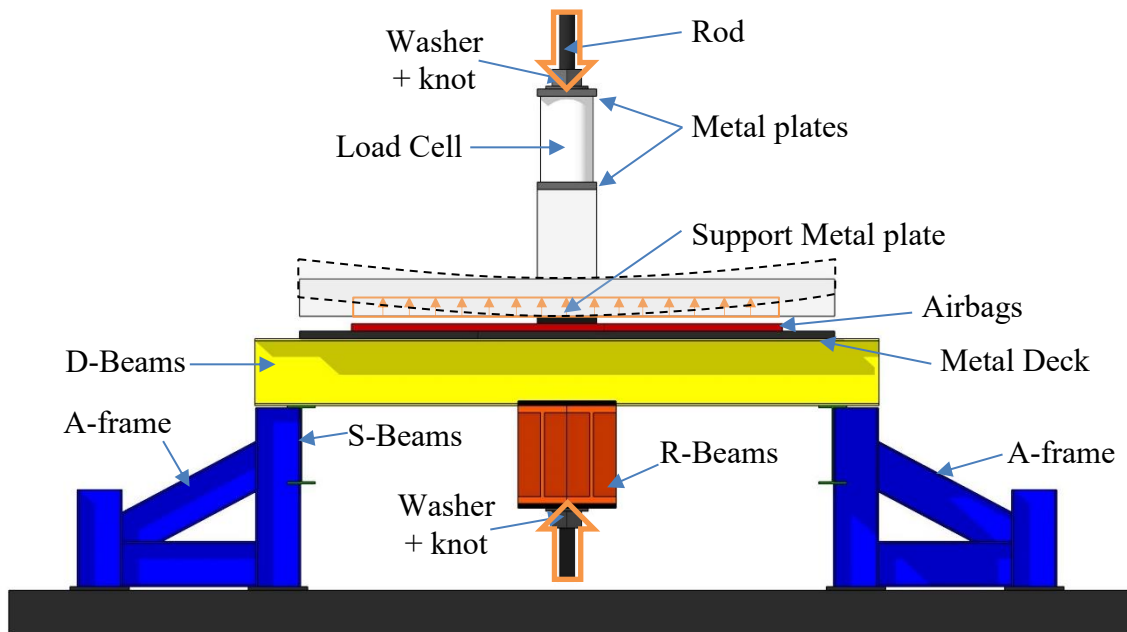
Uniform Load Test Setup. Front view, main parts.
